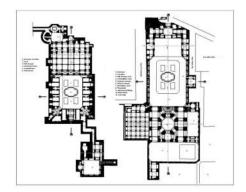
The ground floor and basement plan of the Aghabozorg School-Mosque.
